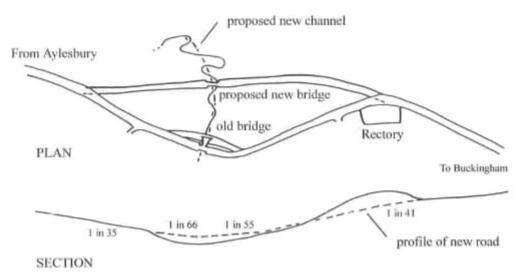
Simplified version of Cooling's plan of a proposed new road and bridge situated downstream from the old bridge. July/August 1836. (BRO, T3/55/2)
